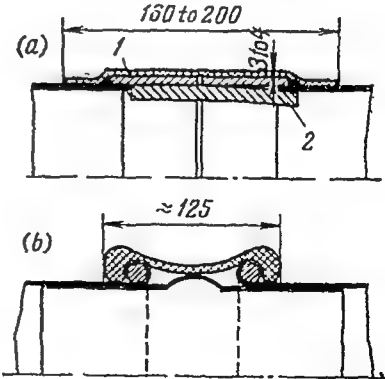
Ring joint for ducting: 1—sleeve, 2—steel dowel rod
